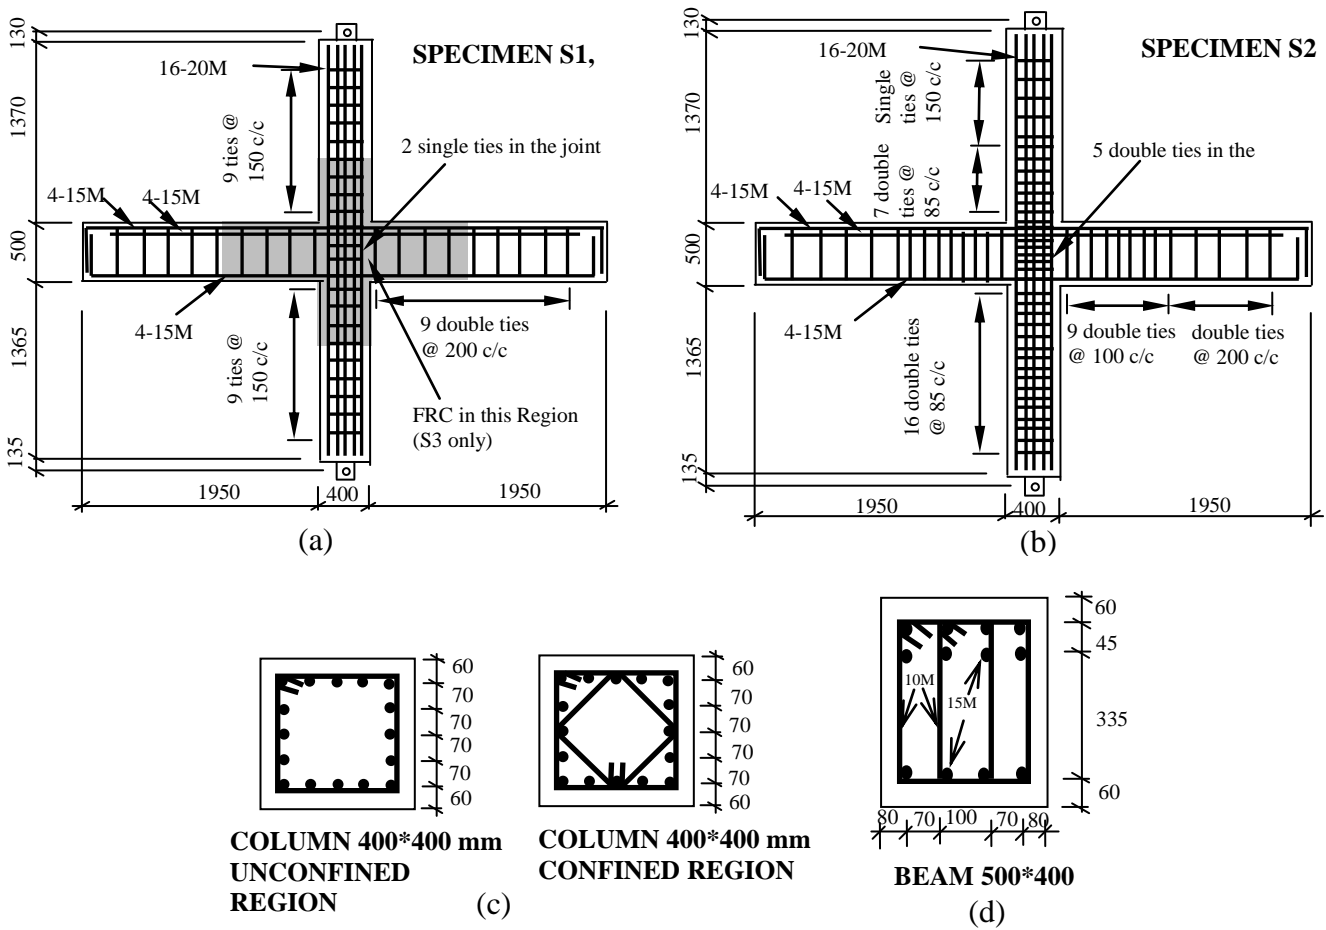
Details of (a) specimens S1 and S3, (b) specimen S2, (c) column cross-section and (d) beam cross-section tested by Filiatraut *et al.* [4] – all dimensions are in mm
